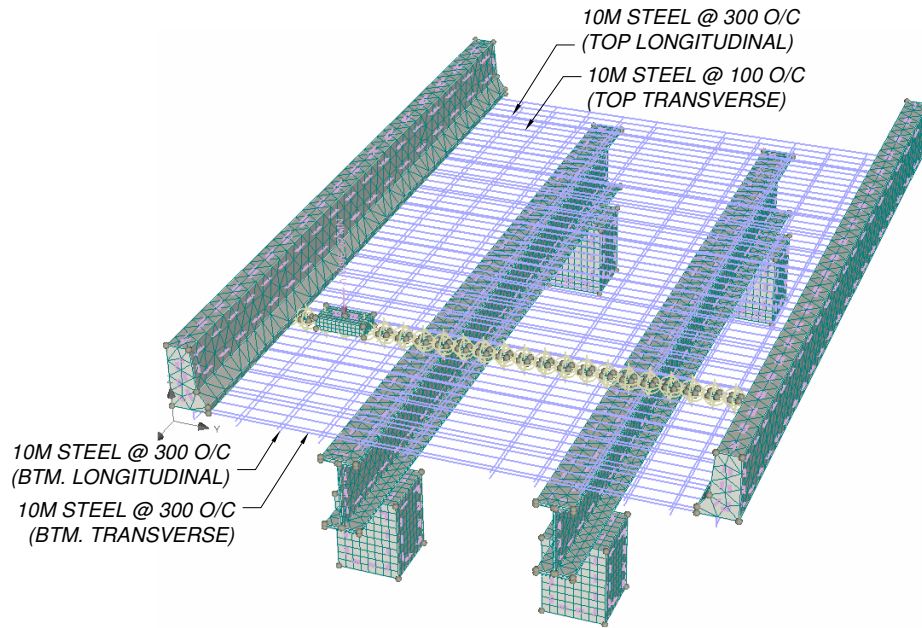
Isometric view of the discrete modeling of internal reinforcement for the cantilever section with steel reinforcement
